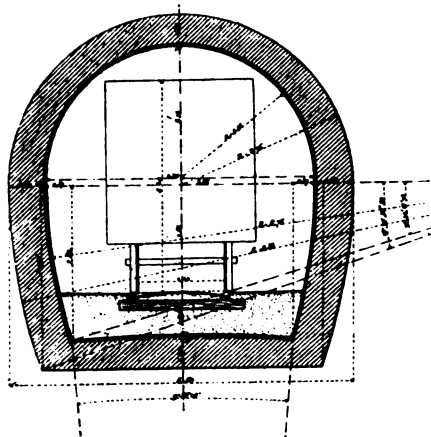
SECTION OF SINGLE TRACK TUNNEL.
